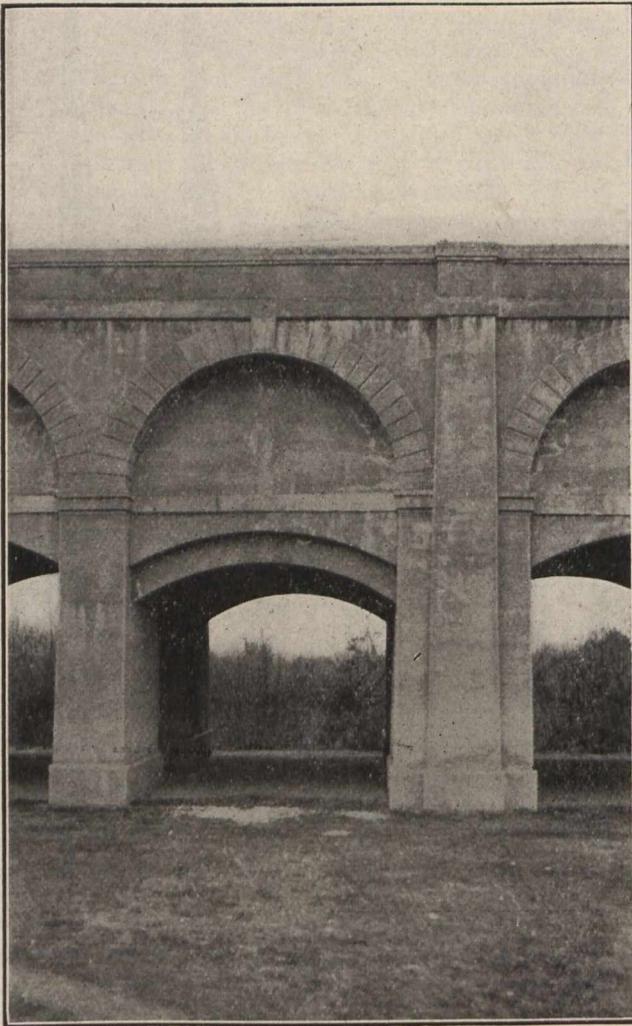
Vizzola: Side Elevation of Aqueduct.
